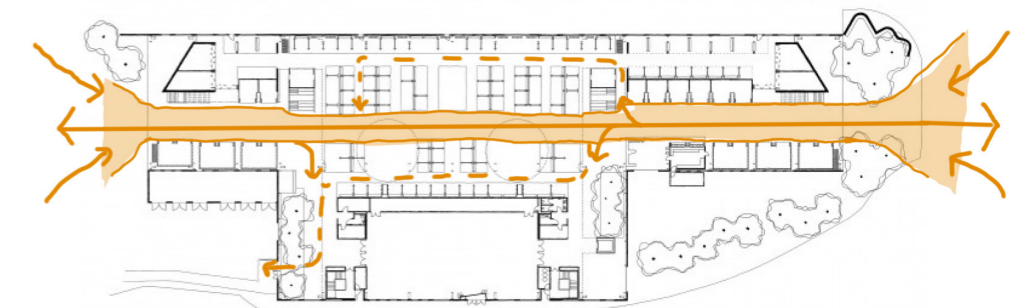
Diagram of pedestrian street on ground floor (Author, 2022)
